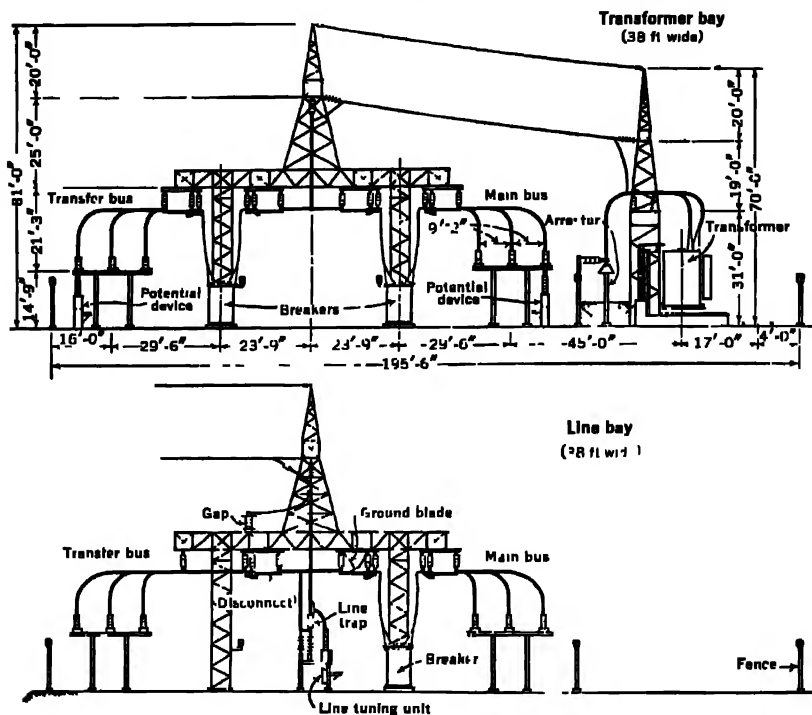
Typical rigid-type switchyard construction for level terrain (154 kv).
